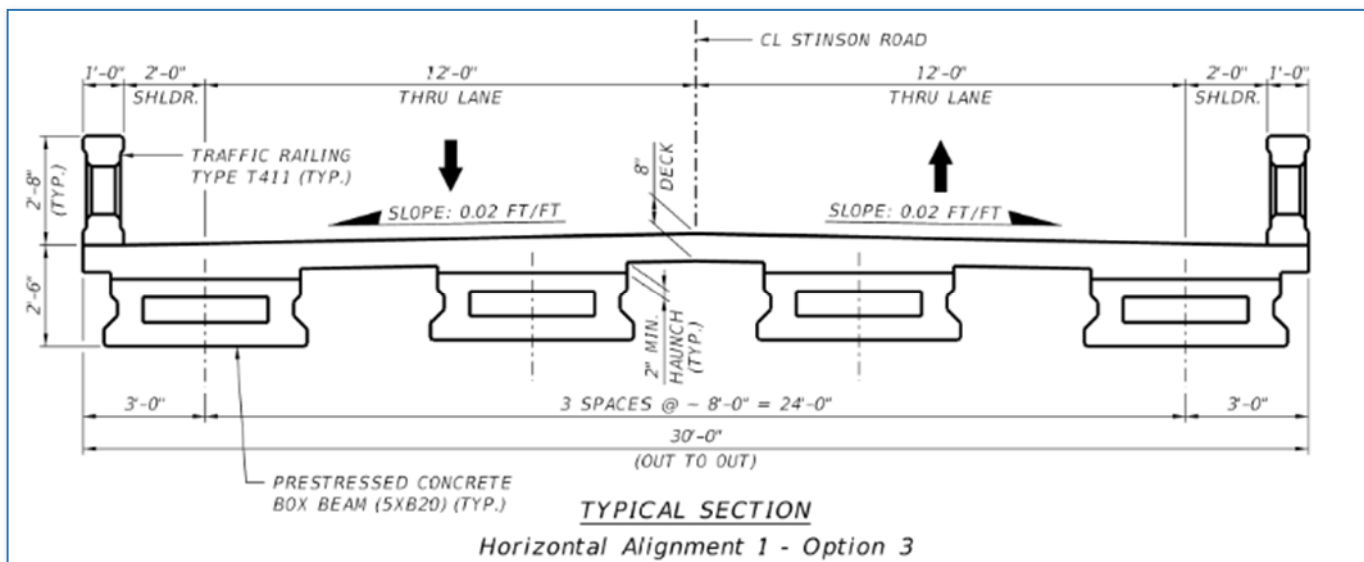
TxDOT Prestressed Concrete XBeams (5XB20) Typical Section
